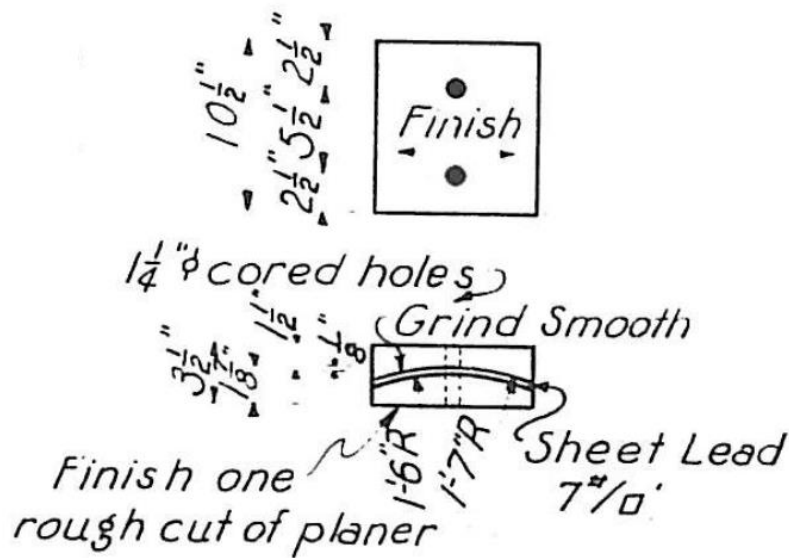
Typical steel ball-and-socket bearing detail, with lead sheet between steel plates.
